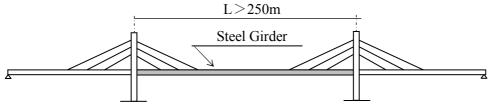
Composite Cable Stayed Girder Bridge
